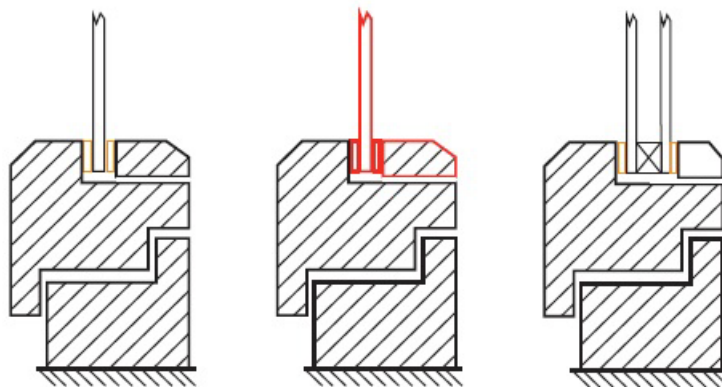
The example of double-glazing pane fixed on the existing timber frame (Source by Konstantinou (2014)).
